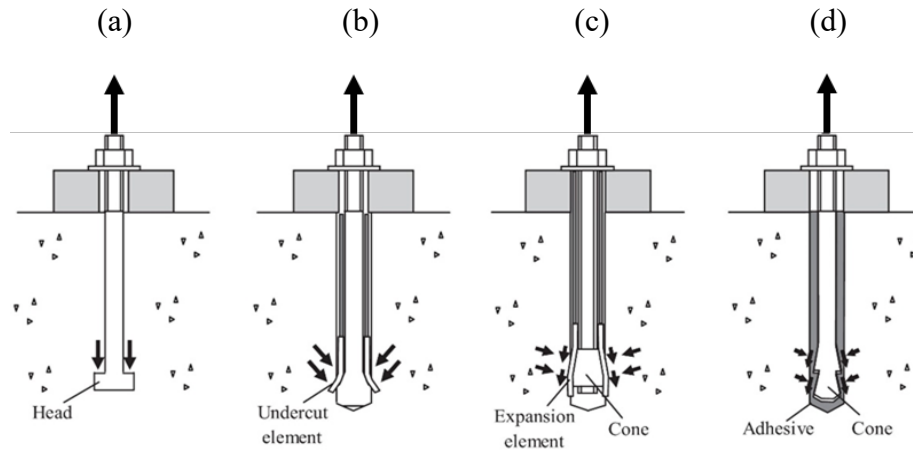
Types of anchors (a) Cast-in headed stud anchor, (b) Post-installed undercut and (c) expansion anchors, and (d) Adhesive anchors (Taken from (P. Mahrenholtz & Eligehausen, 2015))
